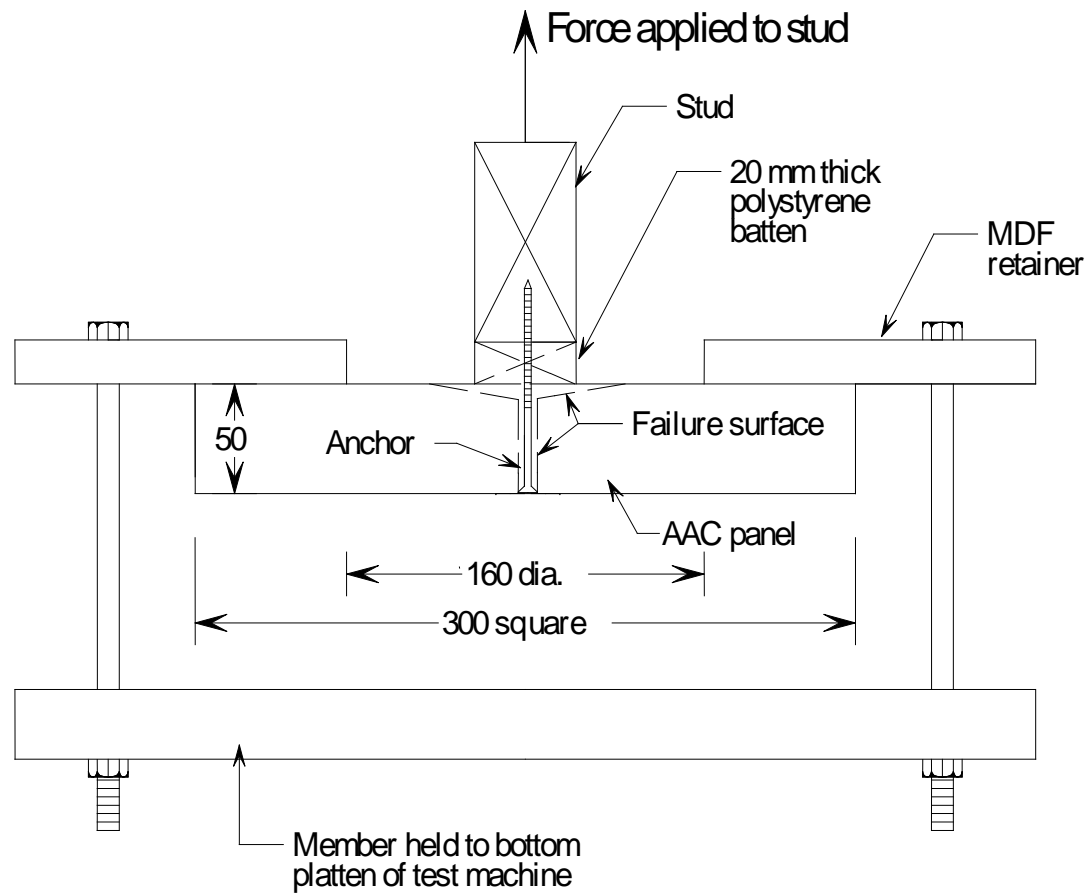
Cross section showing a schematic view of test setup, specimen construction and failure surface in the AAC
